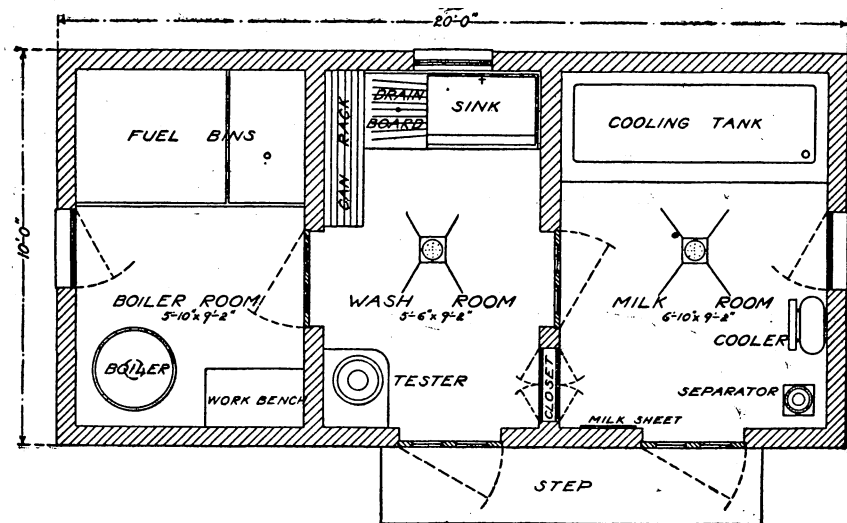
Floor plan of dairy house, showing general arrangement.
